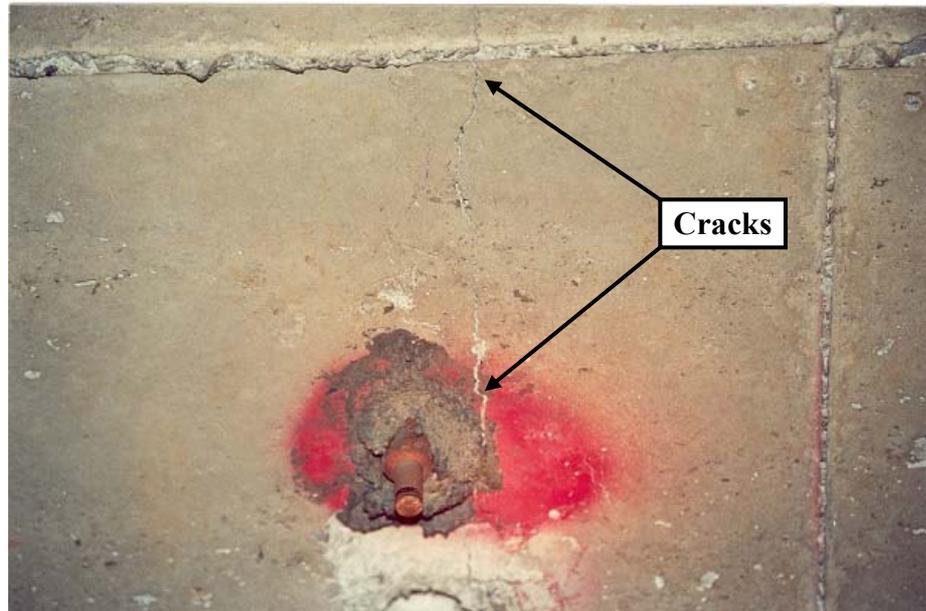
Roof cracks, parallel to culvert axis, between stations Y6 and Y10
